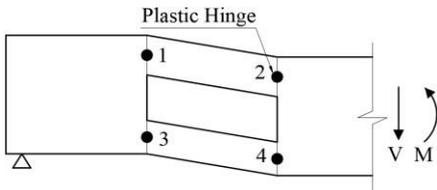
Collapse mechanism of beams with a large opening in the shear zone [32]
